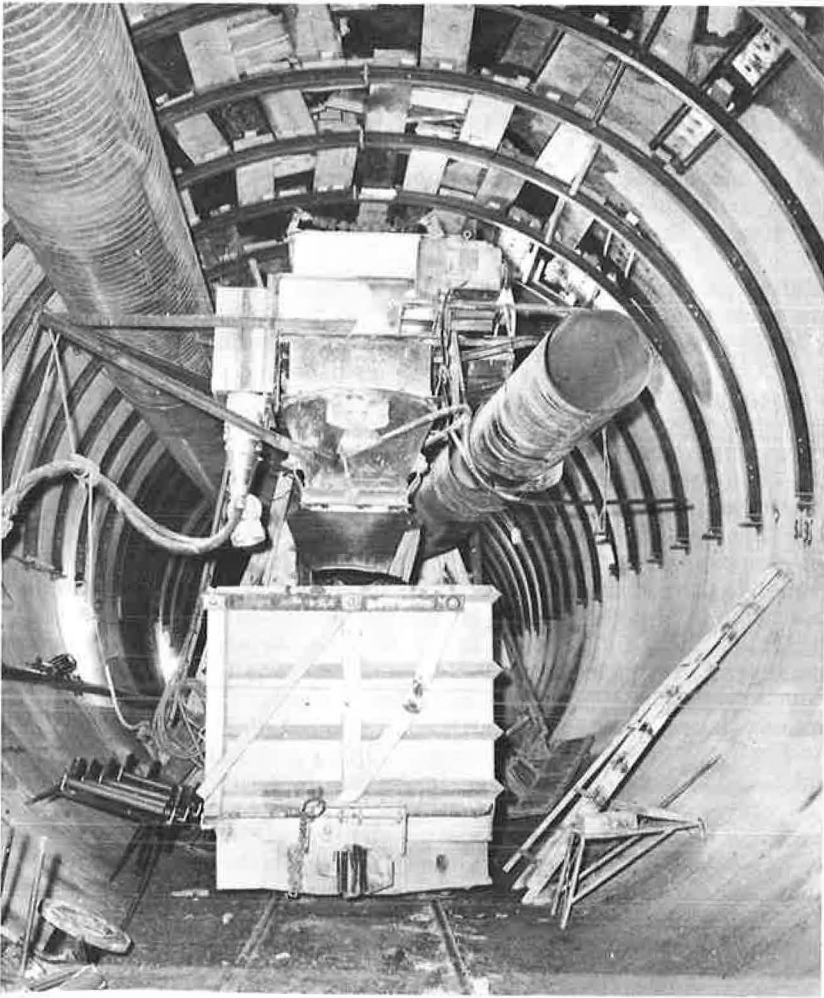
Half-ring supports used in Tunnel 1; conveyor belt in center dumps muck in car at lower center.
